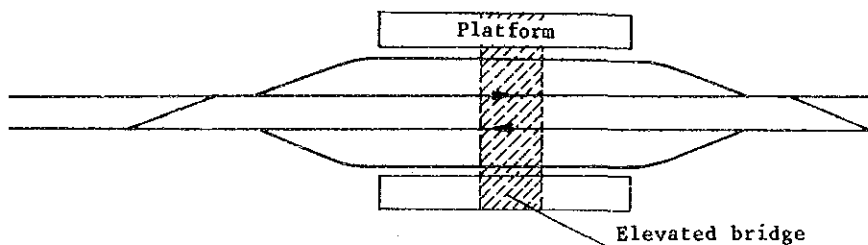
Track Layout of the Intermediate Station
